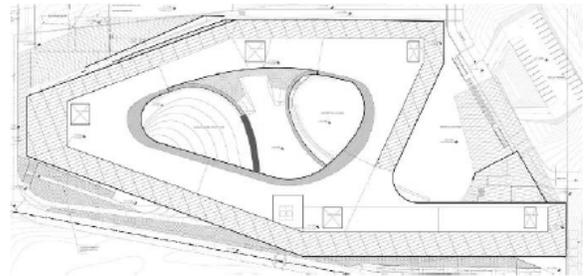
Building layout illustrating the inner core zones, atria locations, bar-sections and perimeter zones
